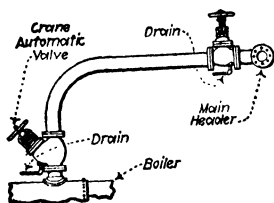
Boiler steam-outlet piping with rigid header connection.
